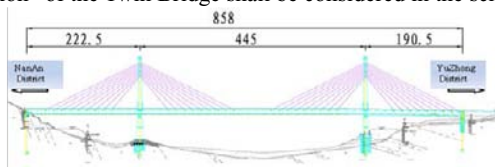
Elevation layout of the Dongshuimen Yangzi River Bridge
